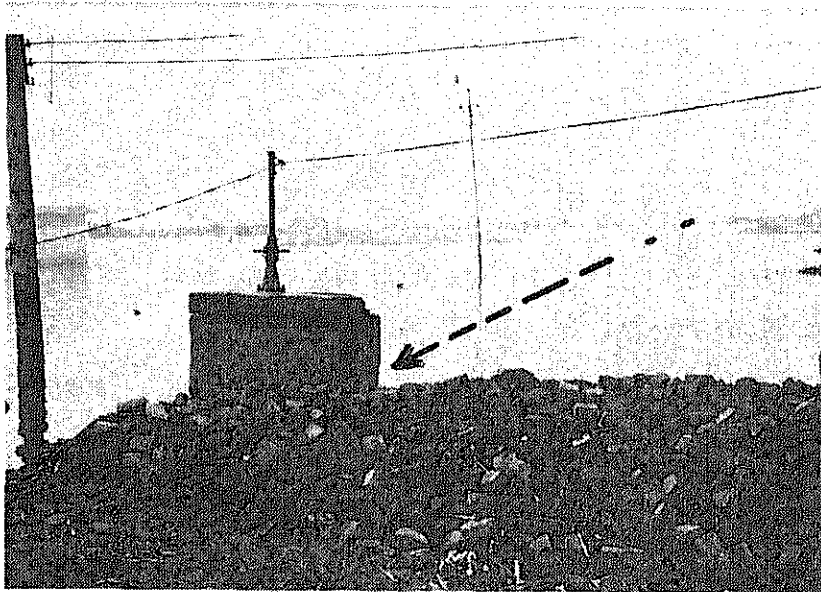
(a): Incoming trunk sewer (pointed by arrow), Hazaribad Lifting Pump Station, 10 September, 1987
